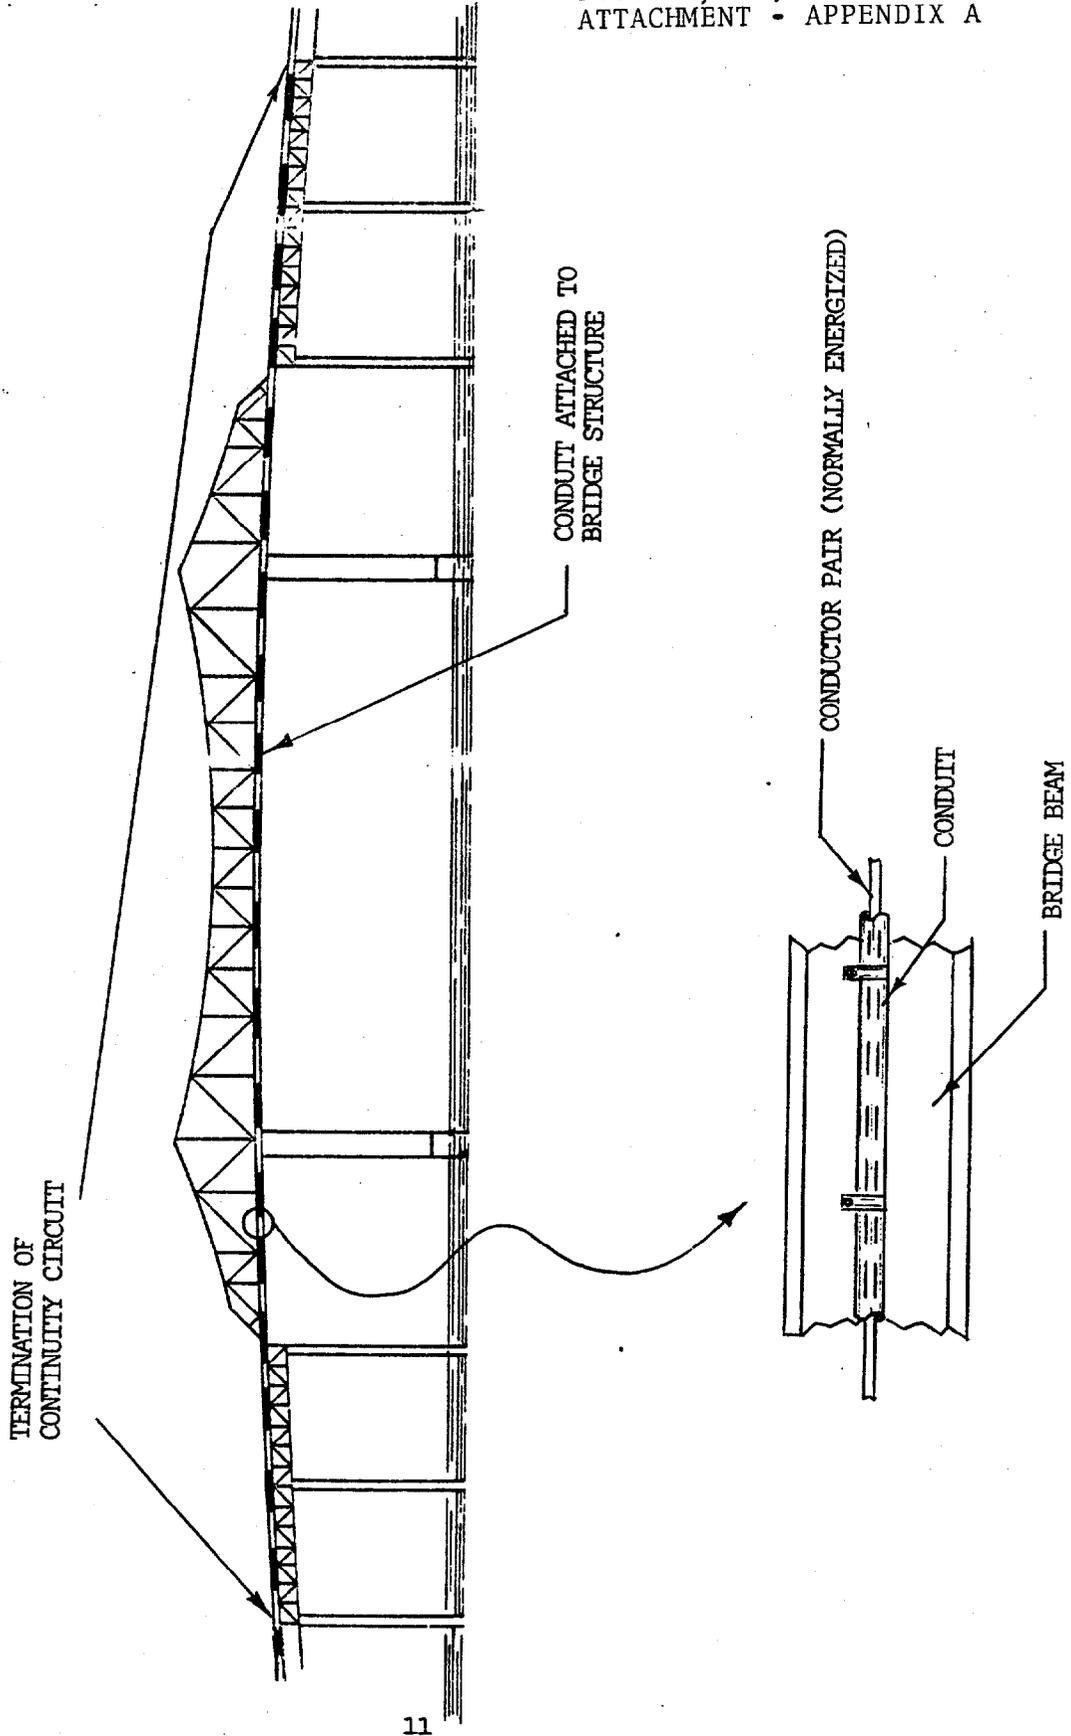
BRIDGE CONTINUITY SYSTEM FOR SUNSHINE SKYWAY BRIDGE
